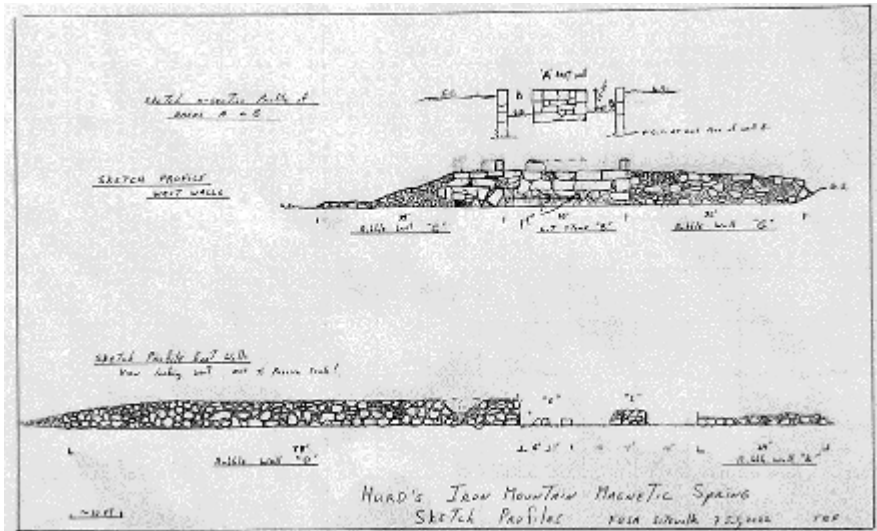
Profile Sketch of (Areas “A” & “B” cross-section); Cut Stone East Wall of Area “B” and Rubble Stone Walls “C” and “G;”
